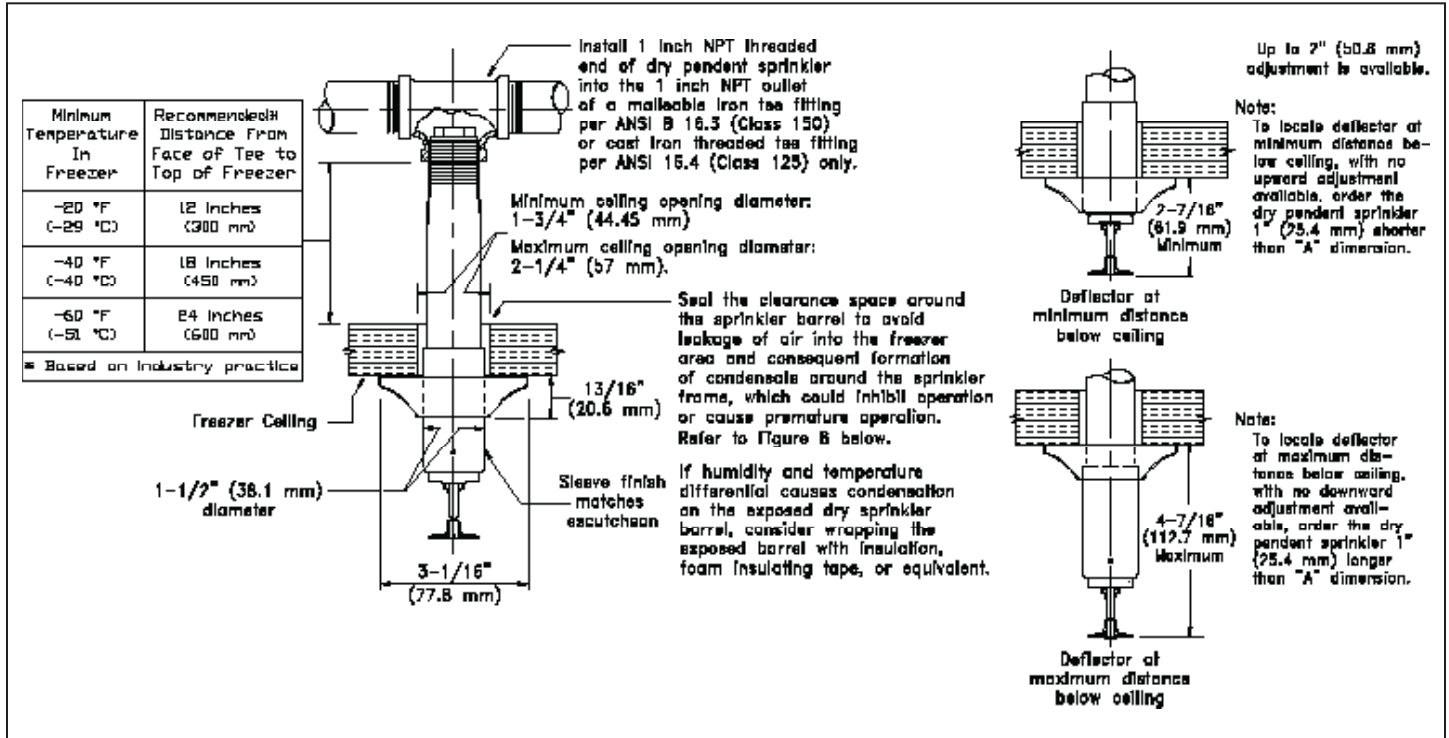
Dry Pendent Sprinkler Installation in Freezers (Adjustable Standard Dry Pendent Sprinkler is Shown)
